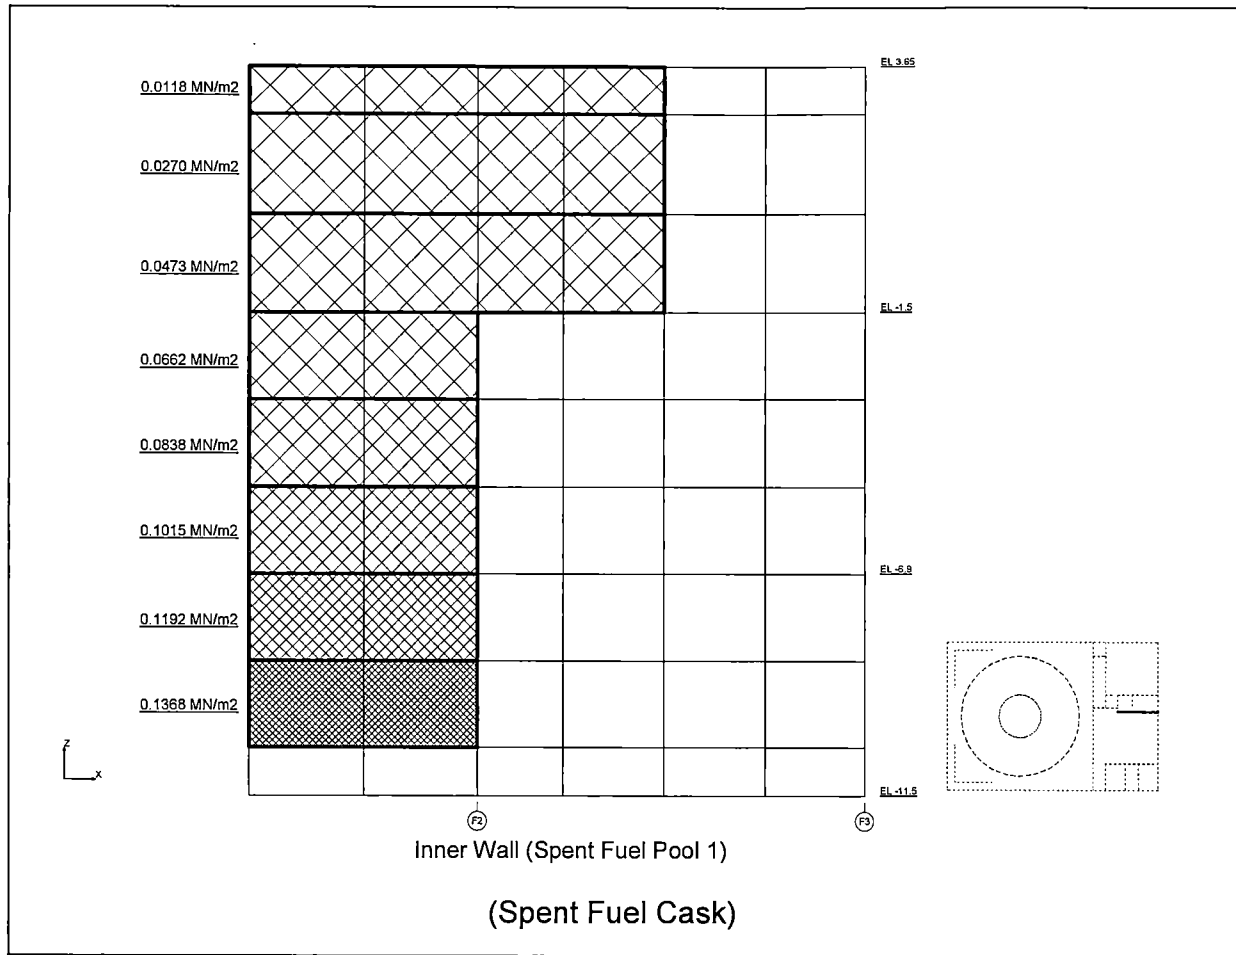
Hydrostatic Loads on the Inner Wall at EL -11,500 (1)
